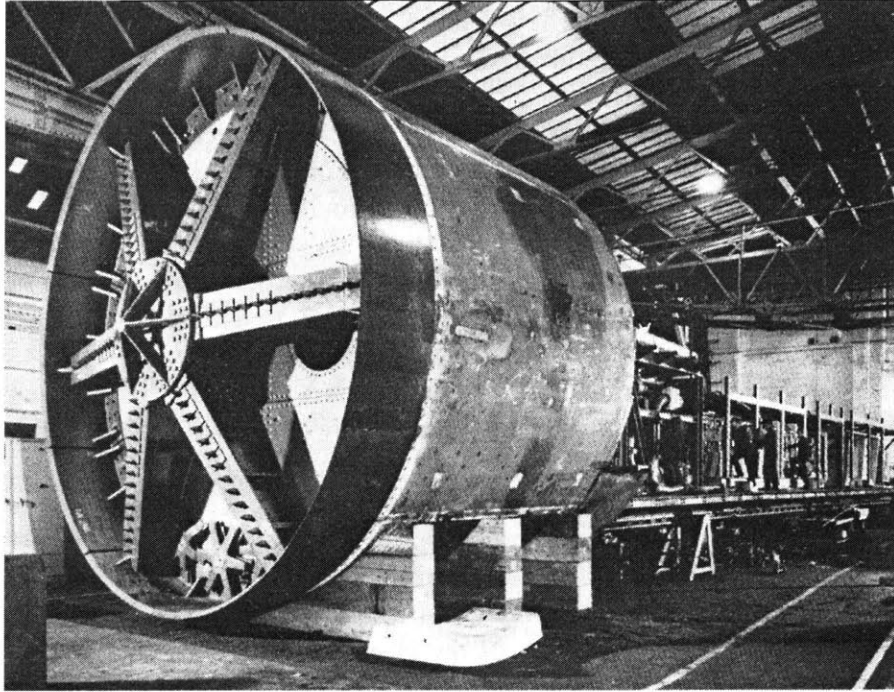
Slurry shield used for the construction of Mexico City sewer tunnel (1969)
